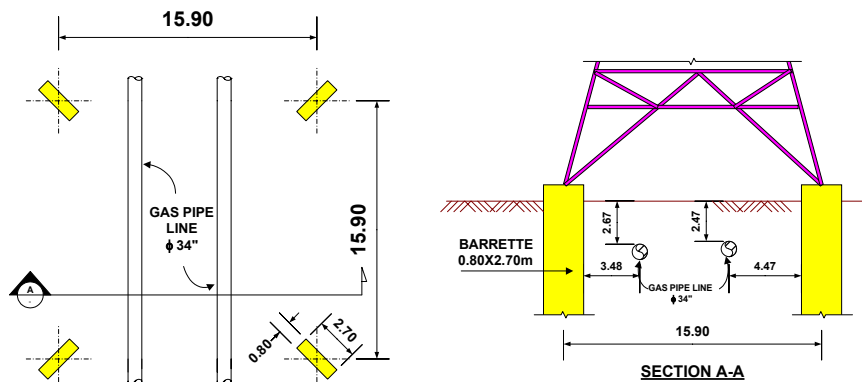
Typical barrette layout for a transmission tower (Lattice Type)
